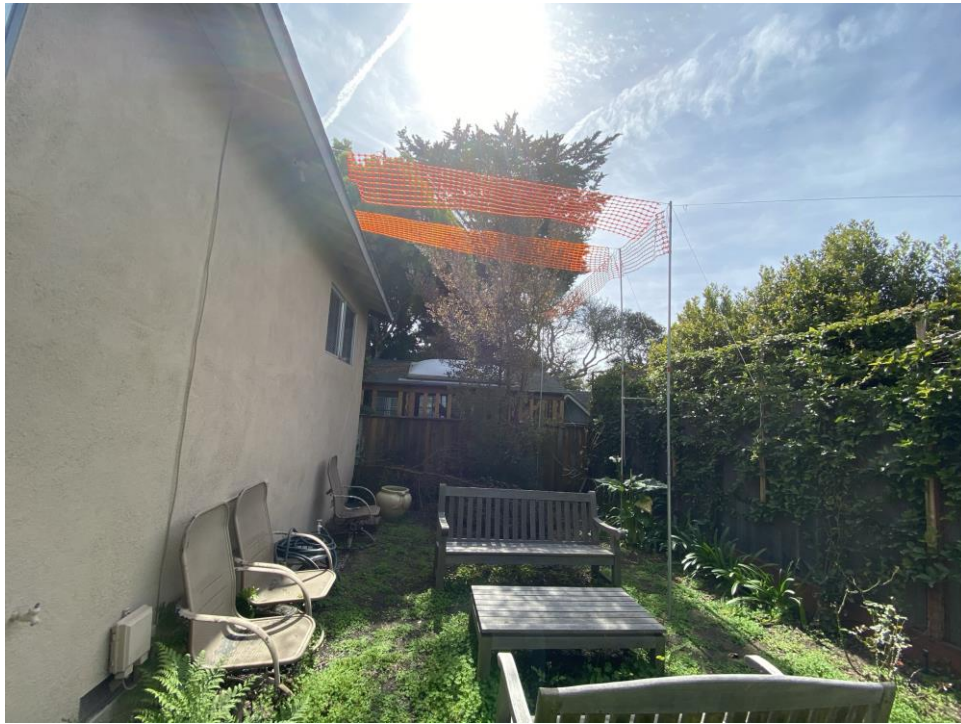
Roof Deck at Far Ridge with Adjacent Neighbor's Residence (north).
